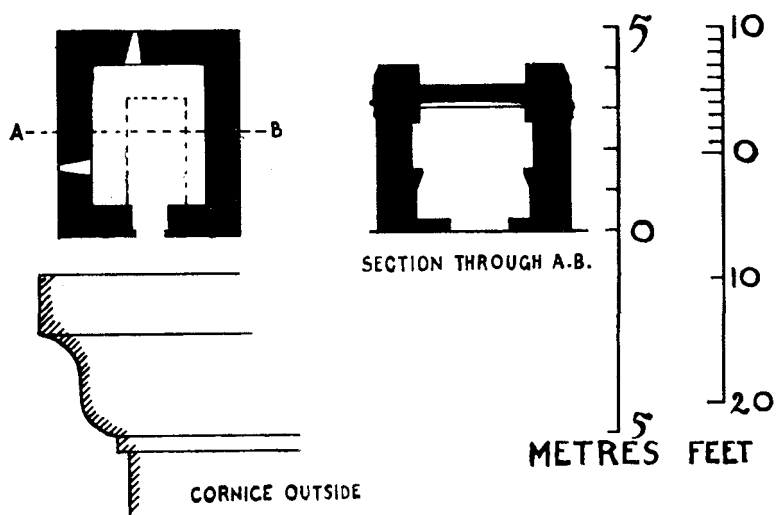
Mausoleum, Maden Sheher, ground plan, section and moulding.
